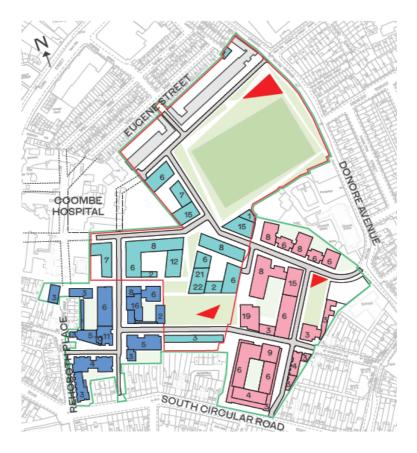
MASTERPLAN BUILDING HEIGHT STRATEGY
